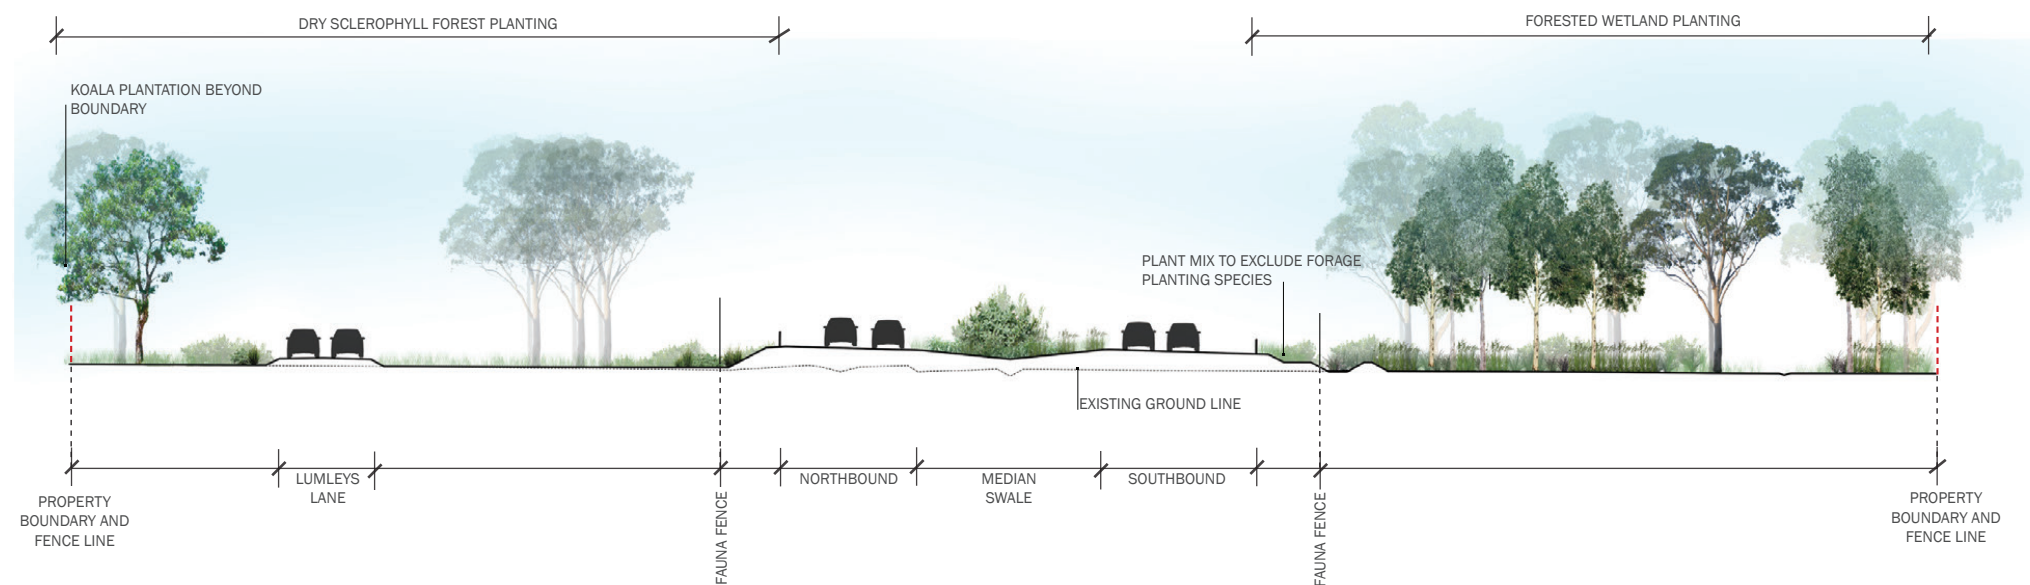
Cross section E-E in Wardell (Scale 1:400)
